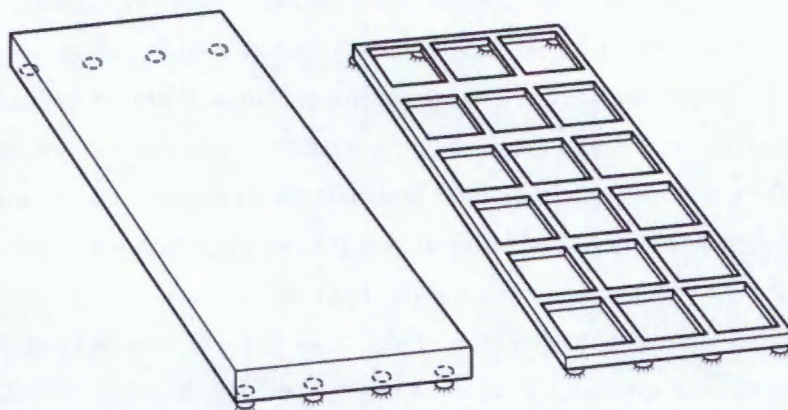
Grillage idealisation of a slab type bridge (Ryall, 2008)
